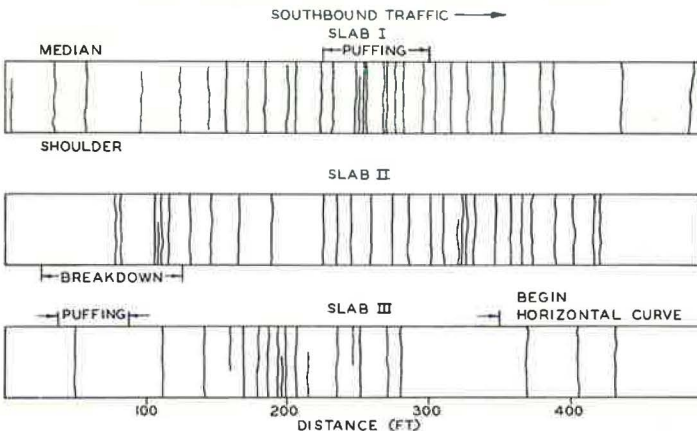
Plan view of test area locating full-width transverse cracks: age of concrete, 3 years.
